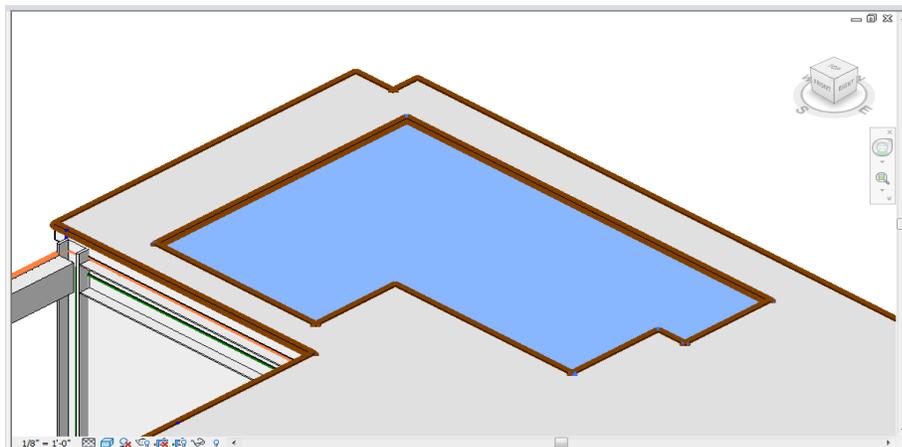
The 3D View of a Slab Depression Within a Structural Floor
